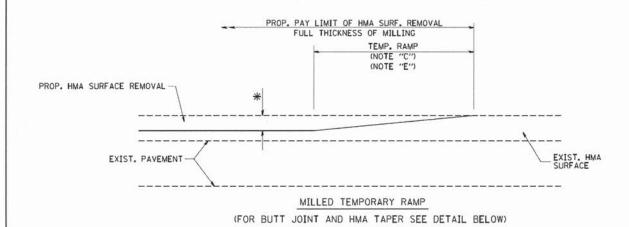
RS FRAMES AND LIDS ADJUSTMENT WITH MILLING BD600-03 (BD-8) SHEET NO. 1 OF 1 SHEETS STA. SCALE: NONE
